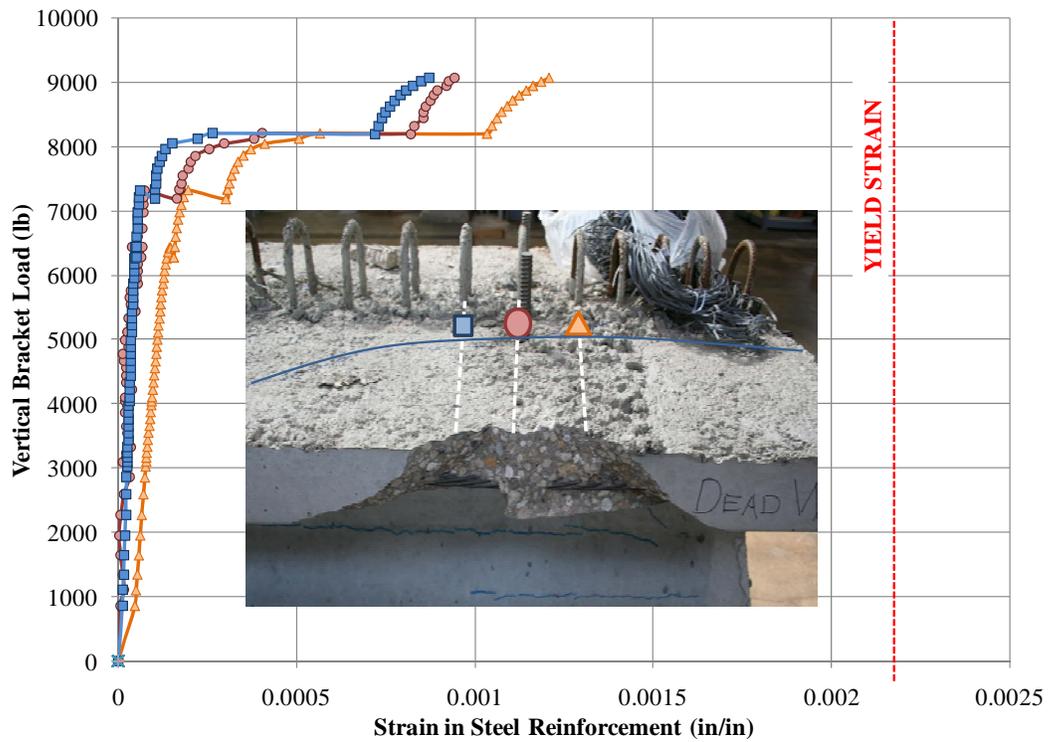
Tx-28-II HF-67 Reinforcement Strain at hanger #1
